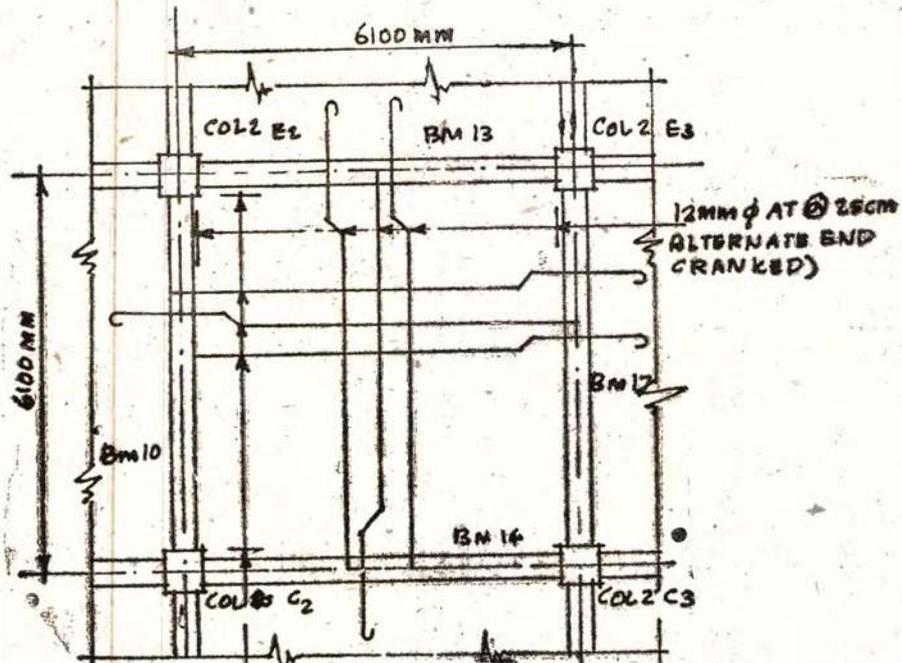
TYPICAL SCHEDULE FOR BEAMS, SLABS AND COLUMNS
